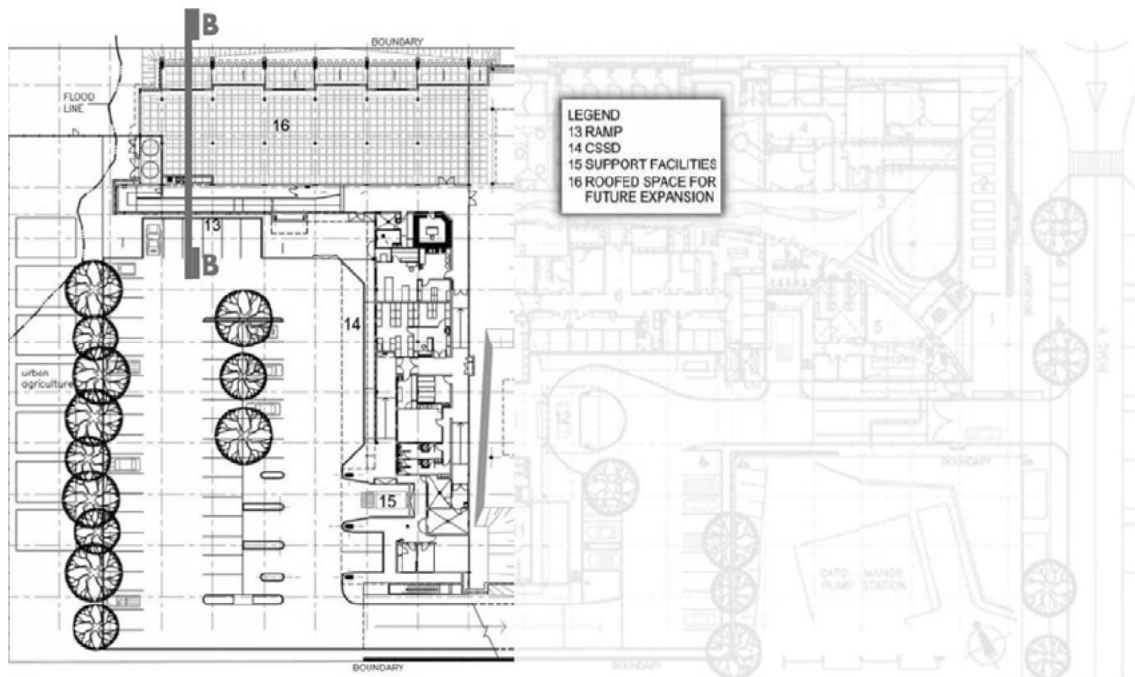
Lower Ground Floor Plan overlaid over First Floor Plan (KZ-NIA Journal).
